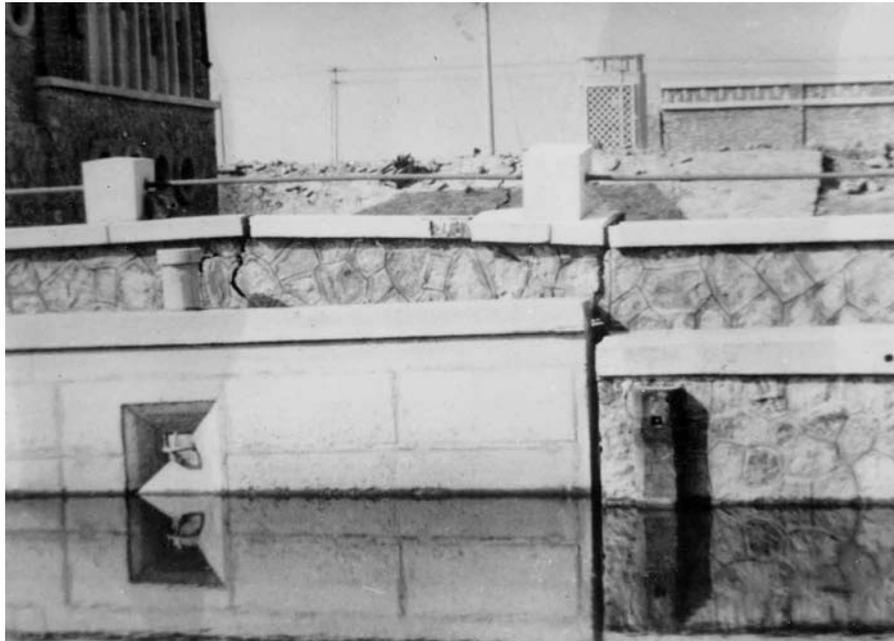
Two sections of the masonry retaining wall and reinforced concrete chamber, having a seam at the center of the floor, dislocated at the Beitang shiplock chamber.
